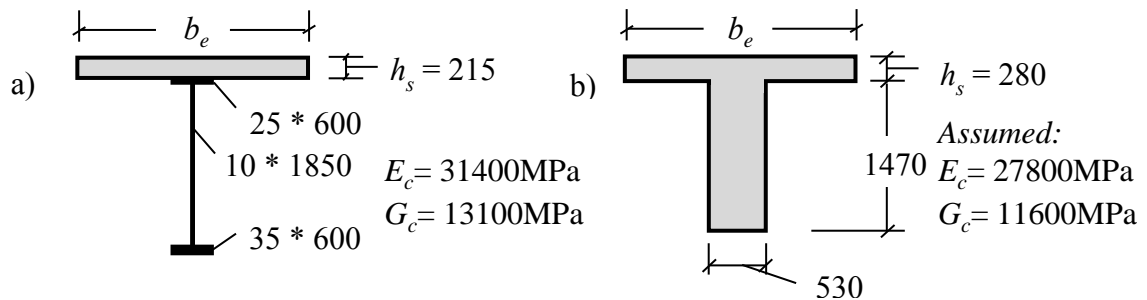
Typical floorbeam cross sections: a) steel; b) concrete (dimensions in mm).
